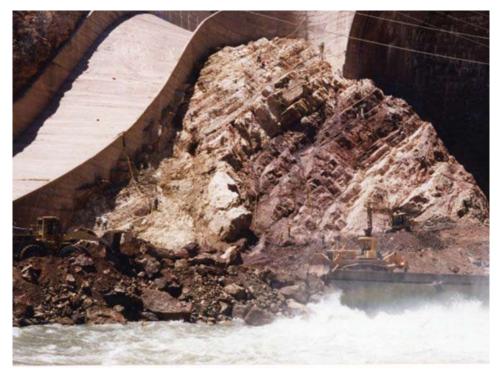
Photo of lower right abutment of dam and right spillway chute. Right abutment overtopping and excavation and cleanup in progress (Reclamation).
